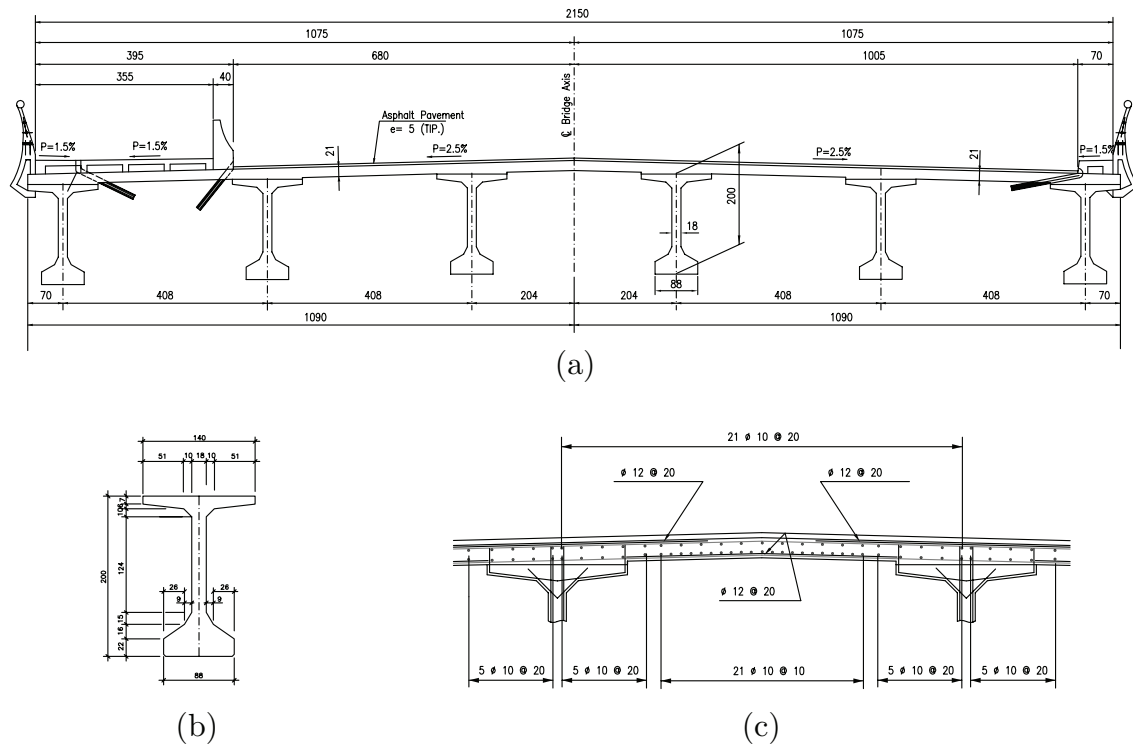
Schematic of (a) the bridge superstructure at interior spans, (b) deck girder beam, (c) reinforcement arrangement of deck slab. (courtesy Ministerio de Obras Públicas, Chile)
